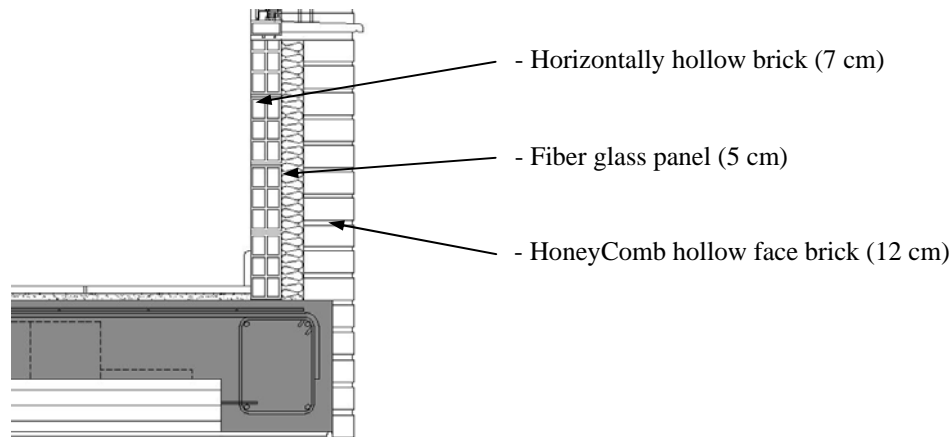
Section of residential building's external walls situated on Tavernes Blanques.
